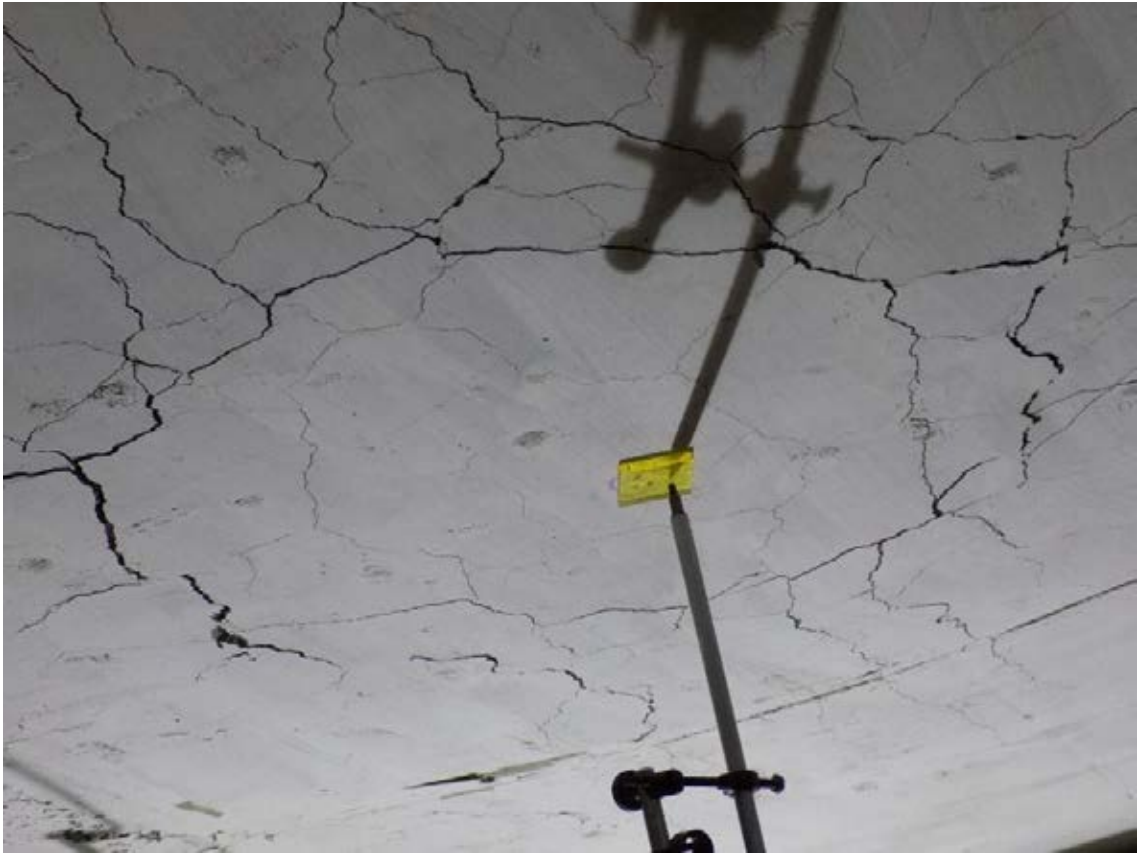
Observed Crack Pattern of Slab Specimen V1
